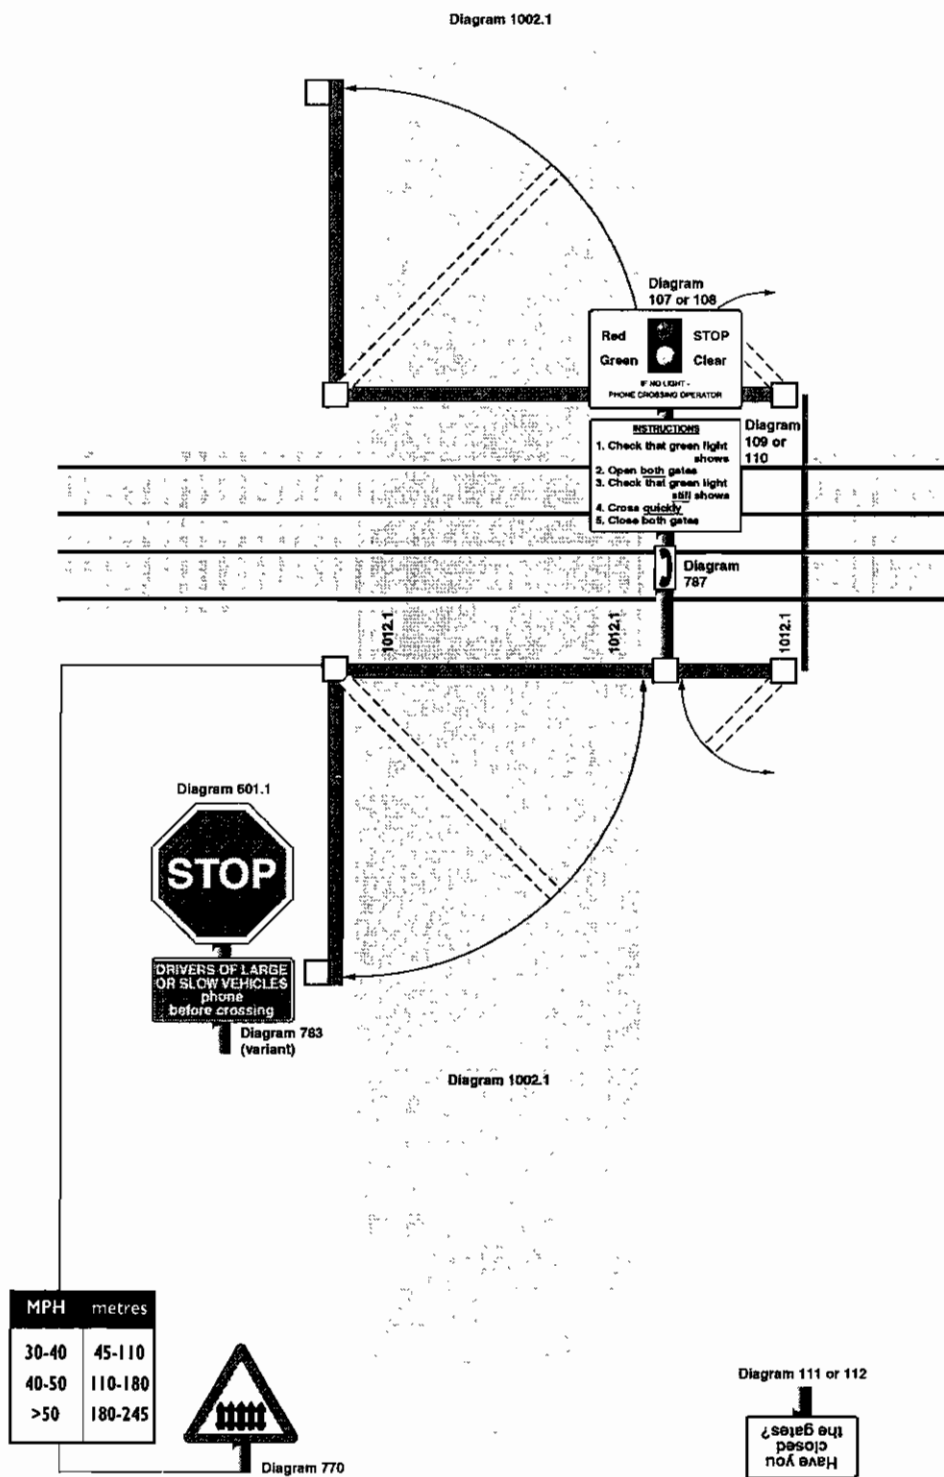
Typical layout of user-worked crossing with adjacent footway or bridleway
